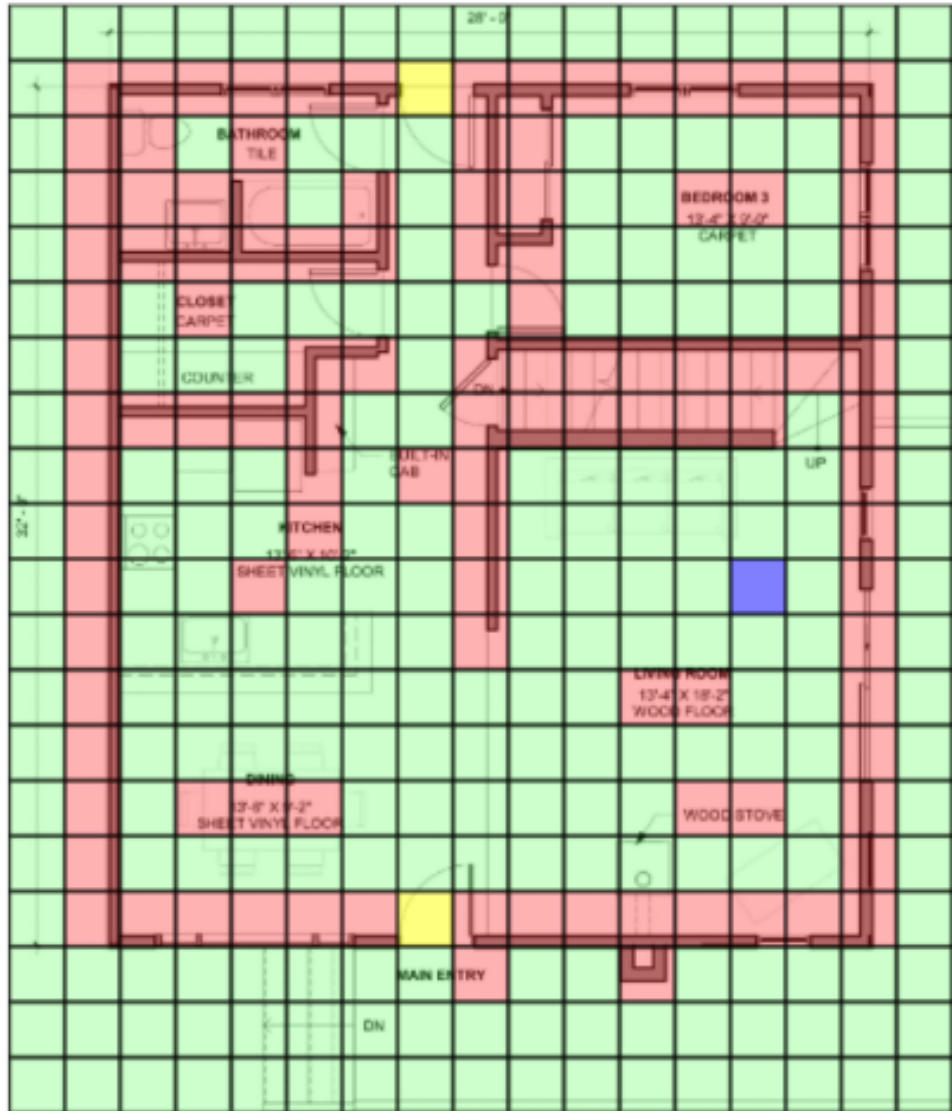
House Floor Plan with Exits (Yellow) and Start position (Purple)
